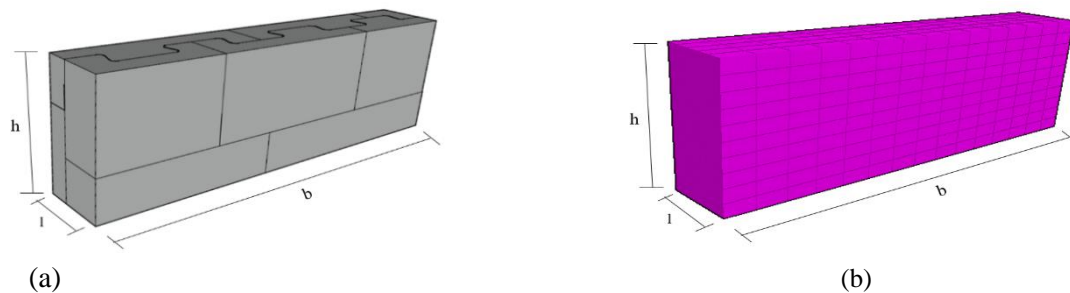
Structural Modelling and Loading of Lightweight Interlocking Bricks Wall, a) Modelling with SketchUp Application, b) Modelling with StaadProVi7 Application.
